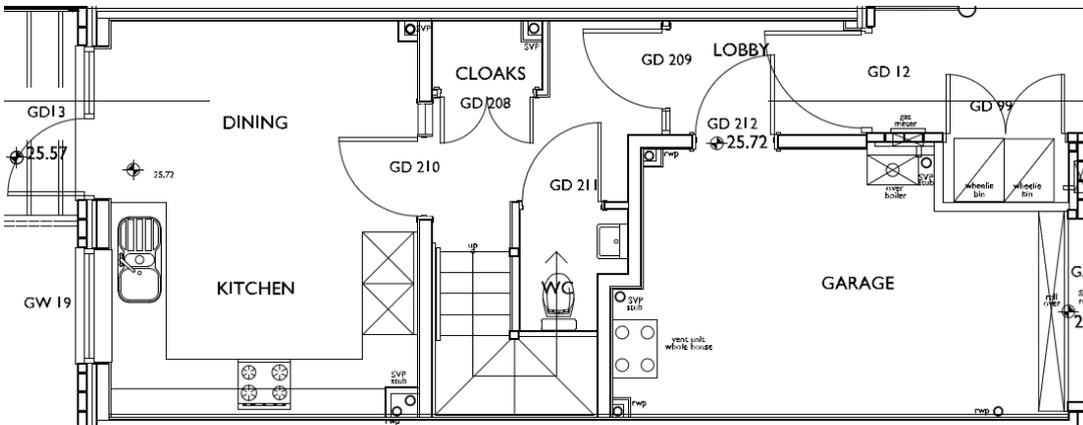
Phase 1 - Ground Floor Layout (Source: Marsh Grochowski, 2010)
